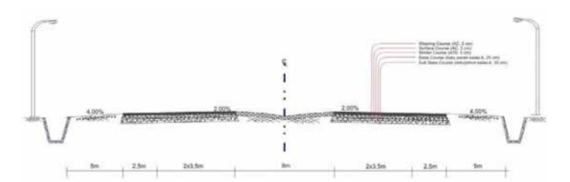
Cross Section of the Planned Access Road to the Port
